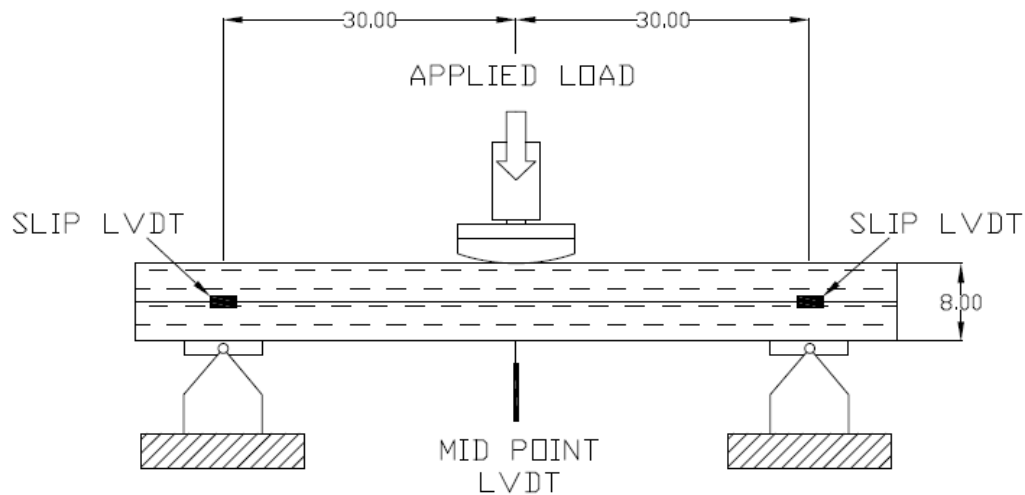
Test setup for Phase 1: Width Series, short span. Drawing shows two stacked 4" deep beams. Dimensions in inches.
